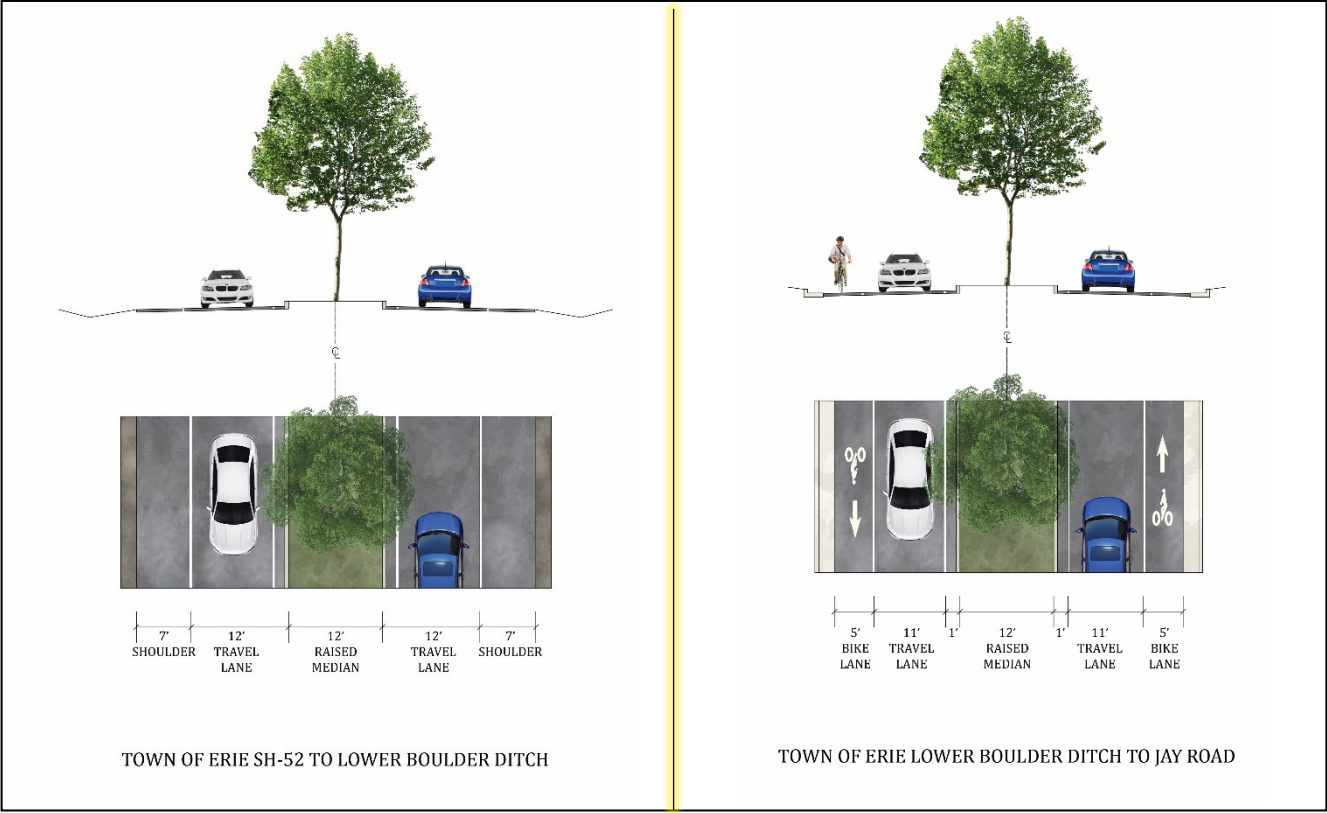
TOWN OF ERIE RECOMMENDED CROSS-SECTIONS
